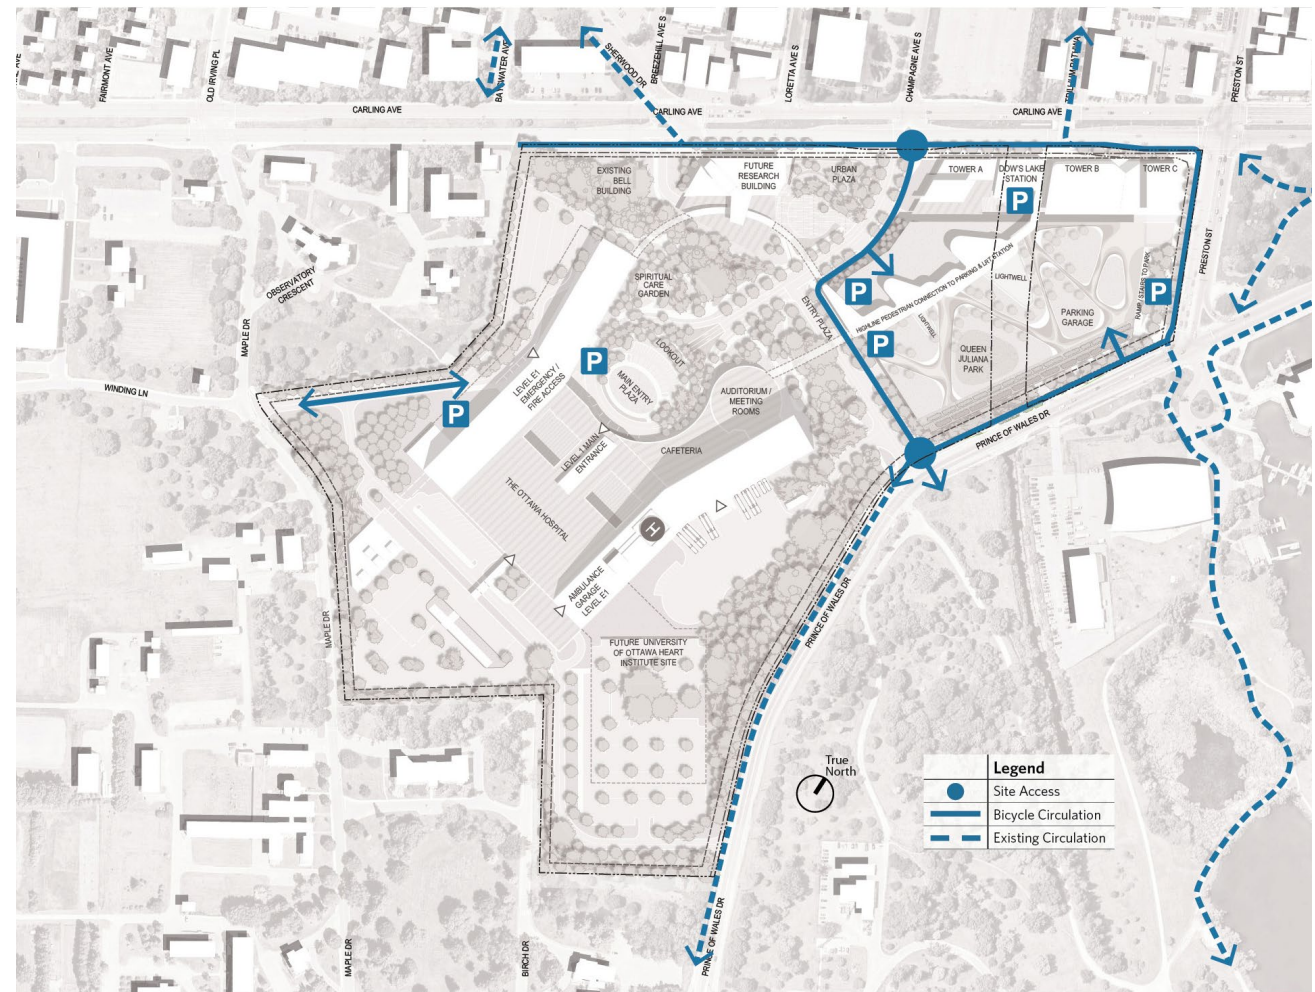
Master Site Plan - Bicycle Circulation on Multi-Use Pathways or Bi-Directional Bikeway and Sidewalks
